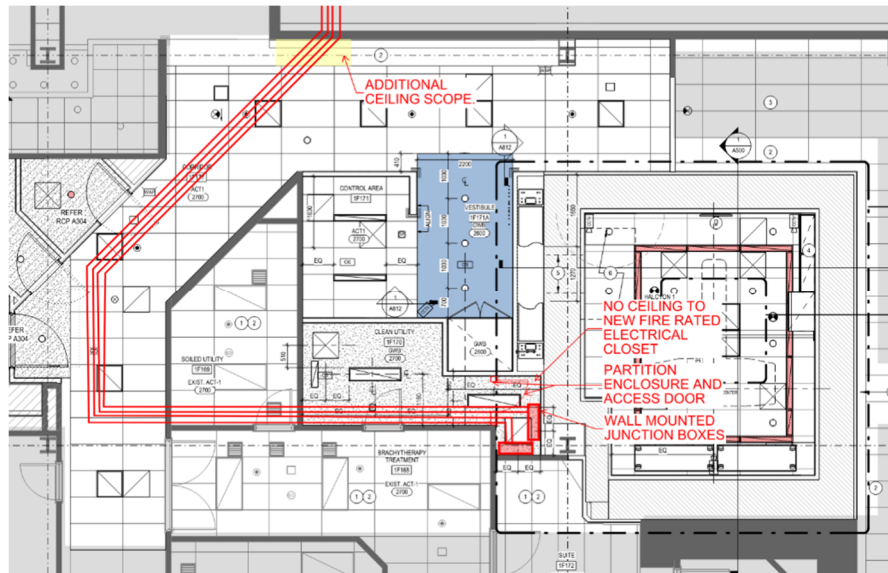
Ceiling Scope in Corridor 1F177 and Adjacent Rooms.
